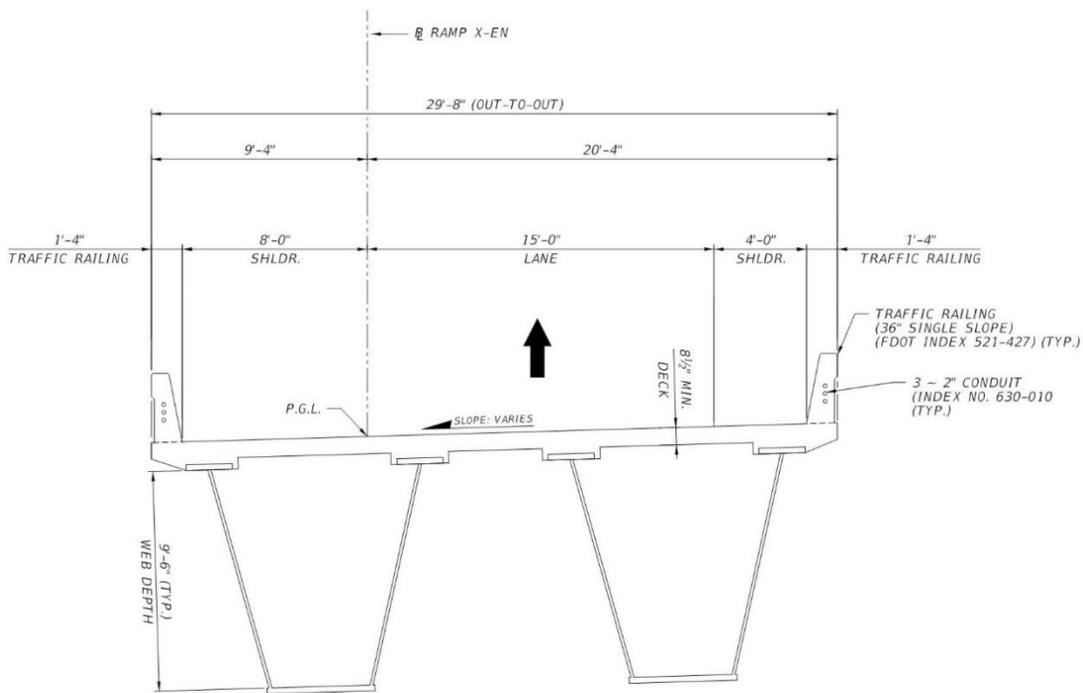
Bridge Typical Section (Bridge No. 3)
